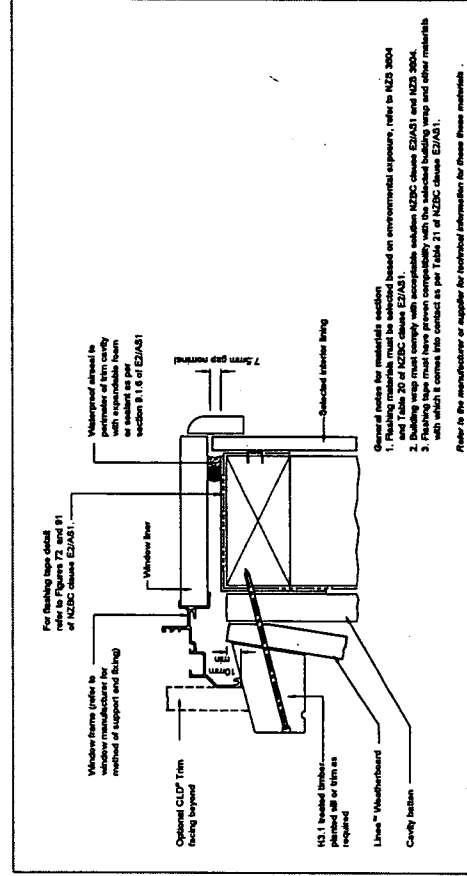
CAVITY WINDOW SILL WITH FACINGS
